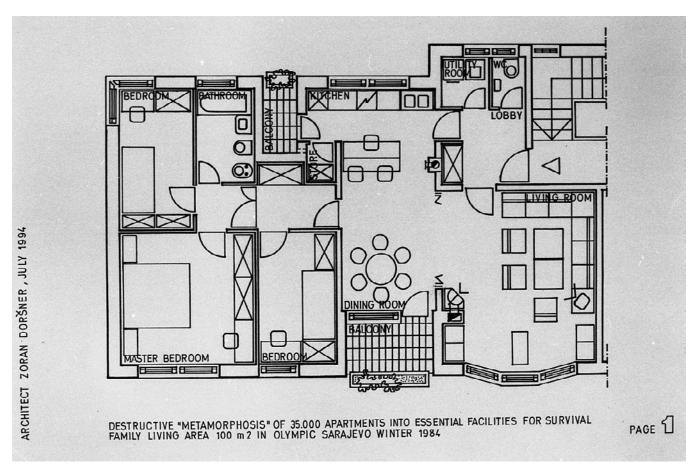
A typical Sarajevan pre-war apartment floorplan; Drawing: Zoran Doršner.
